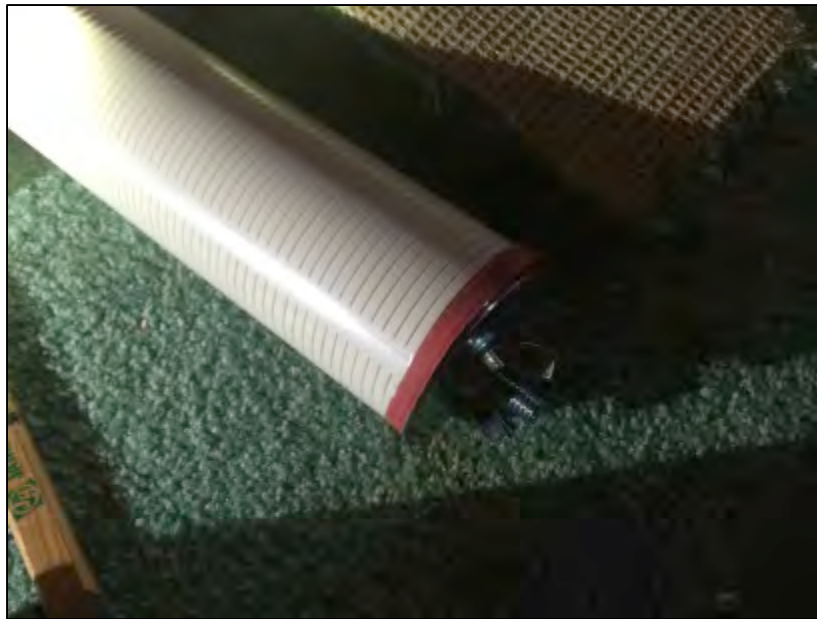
Installing the well screen for the sub-slab depressurization well in the North Duplex building.
